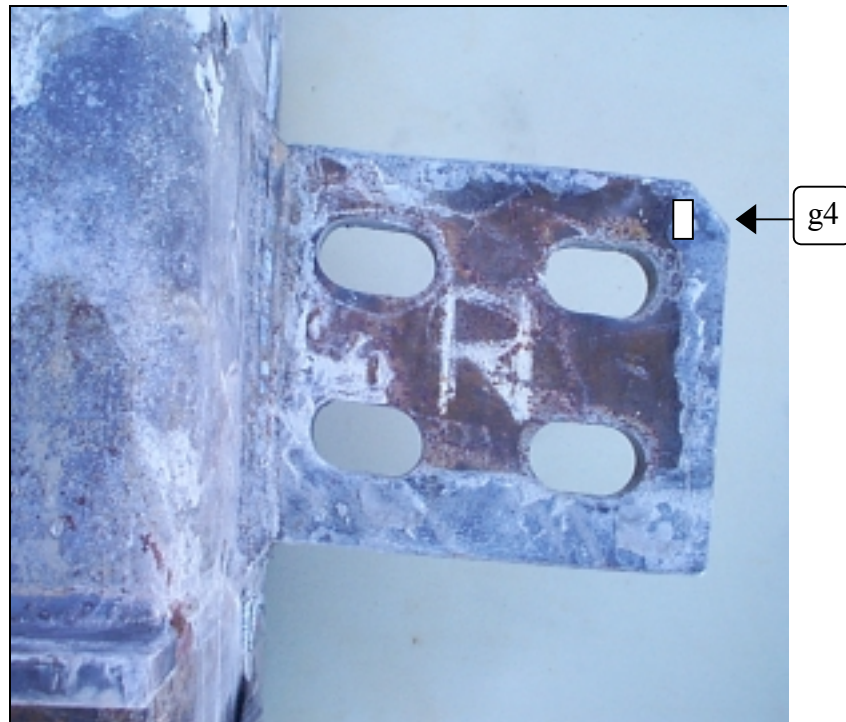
Deformed shear flat (specimen CC1 after test).
